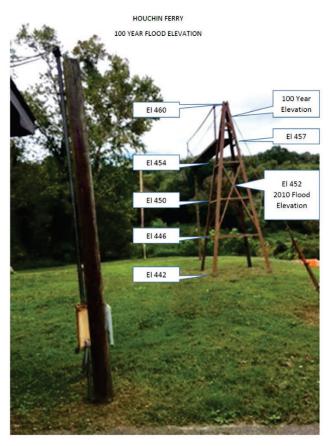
Flood elevations, south side of Houchin Ferry site, as measured against former ferry tower. The tower is on contoured bench above river, which flows past the tower in the background. The pedestrian suspension bridge would be at the 450-foot elevation, which is below the 100-year foot elevation.
